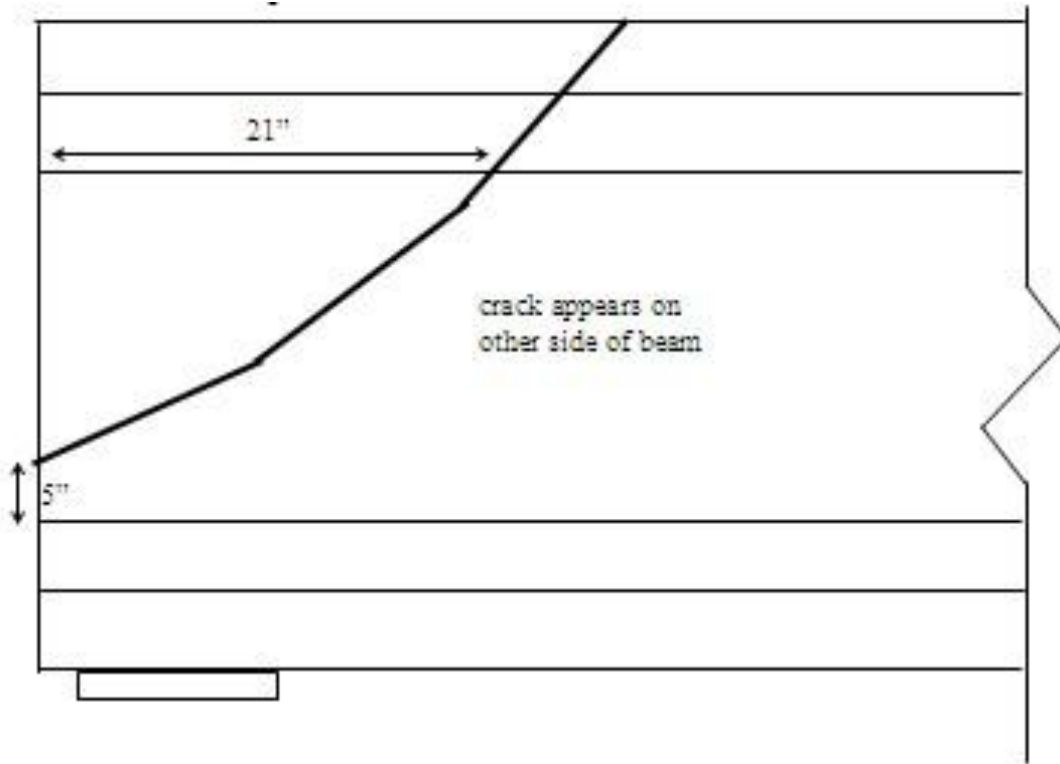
Crack diagram for south span girder, exterior beam, west side, interior face (#7933).
